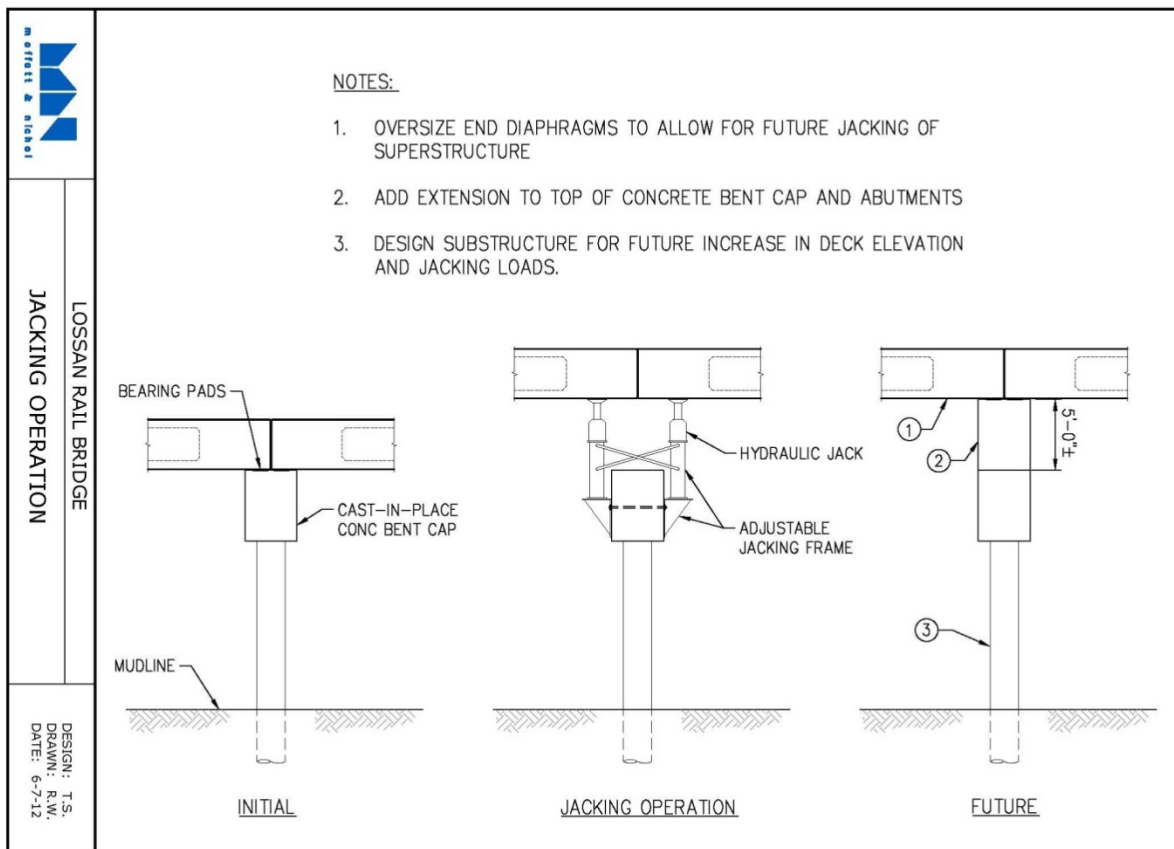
Pier Elevation of Adaptable Bridge Structure Concept
